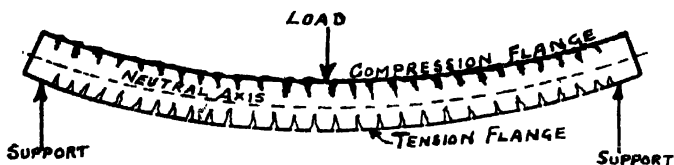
BENDING OF A RUBBER BEAM UNDER LOAD
